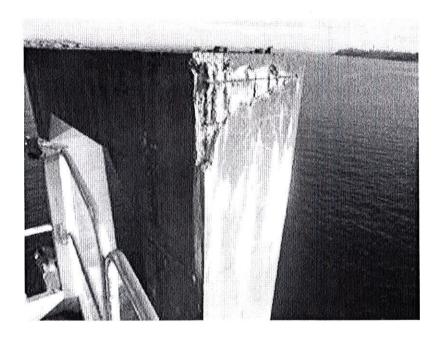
Photo 30 Appendix D Spall Above a Delamination on the South Face of Pier 10 Cap
